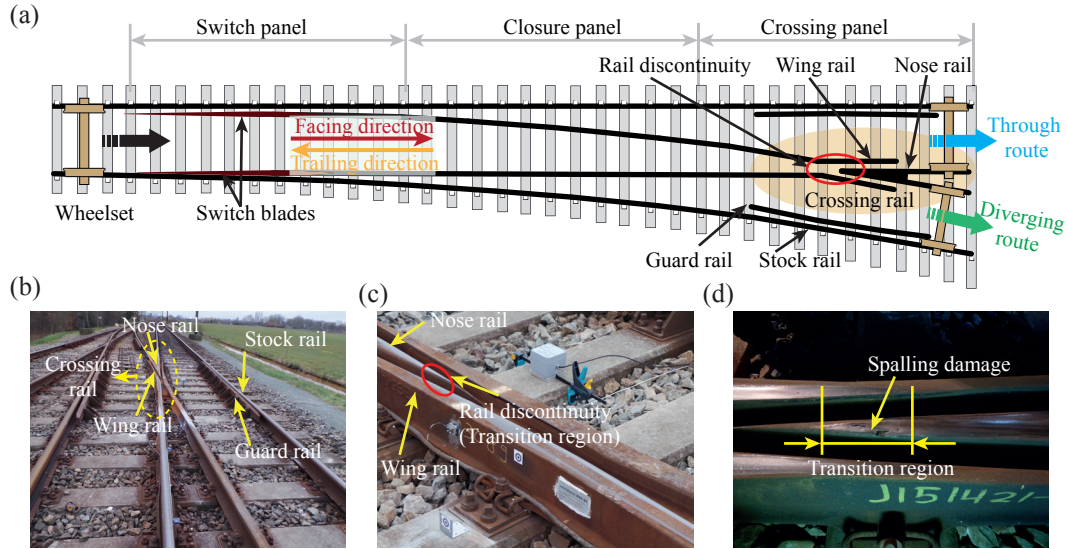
(a) Schematic of railway switches & crossings (adapted from [2], re-drawn by A. A. Mashal and then presented firstly in [3]); (b) 1:9 crossing panel on Dutch railway network (photo taken by V. Markine); (c) Close-up view of this crossing panel (photo taken by V. Markine); (d) Spalling damage on crossing nose (photo taken by Y. Ma).
